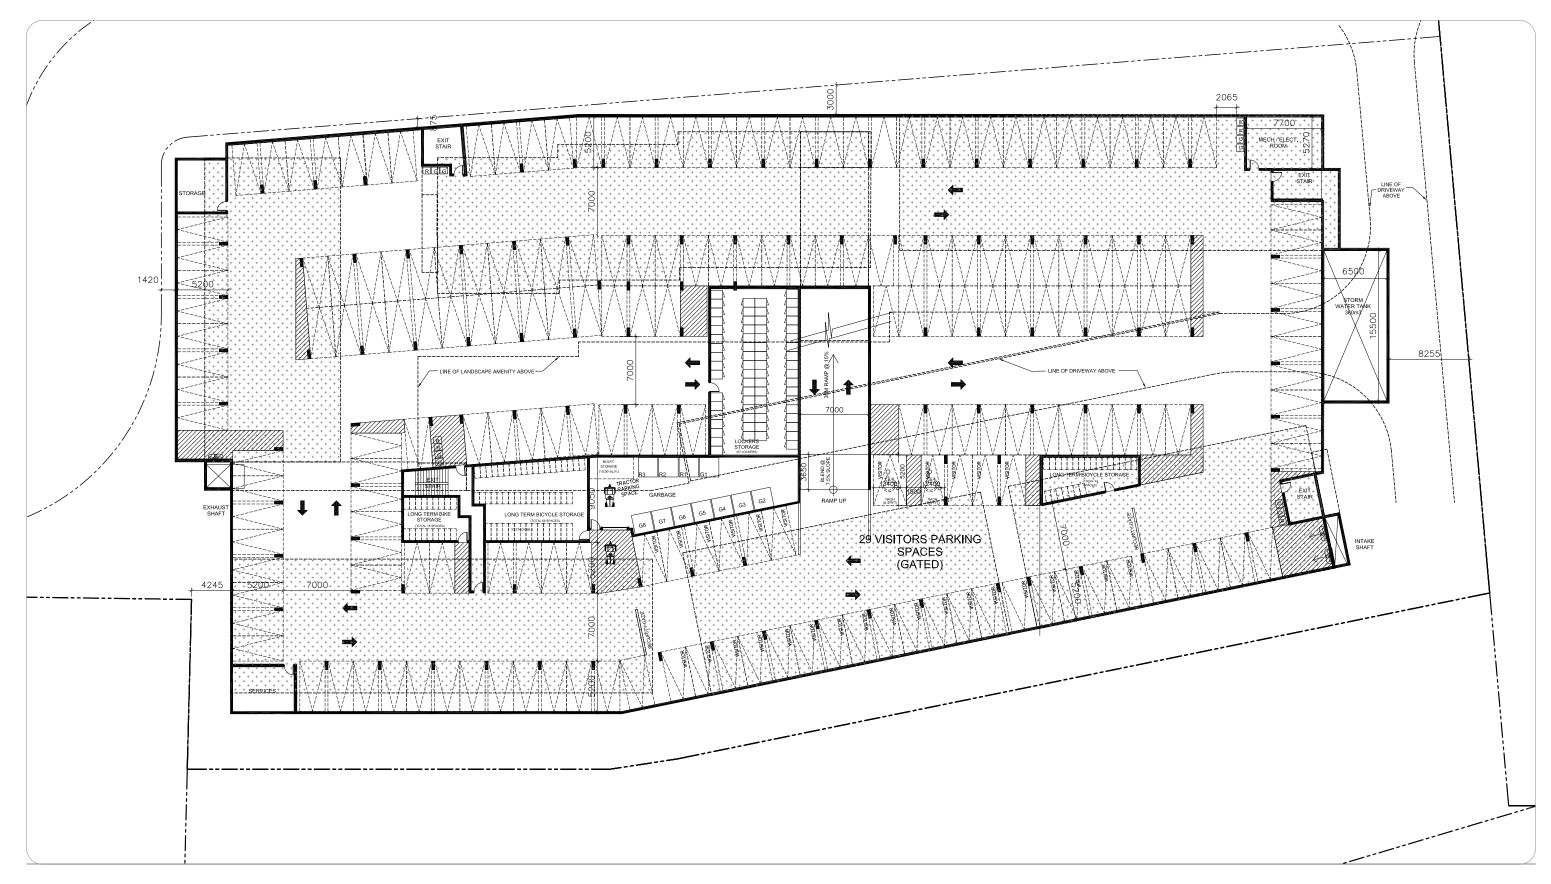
Underground Parking Level 1: Prepared by Kirkor Architects
